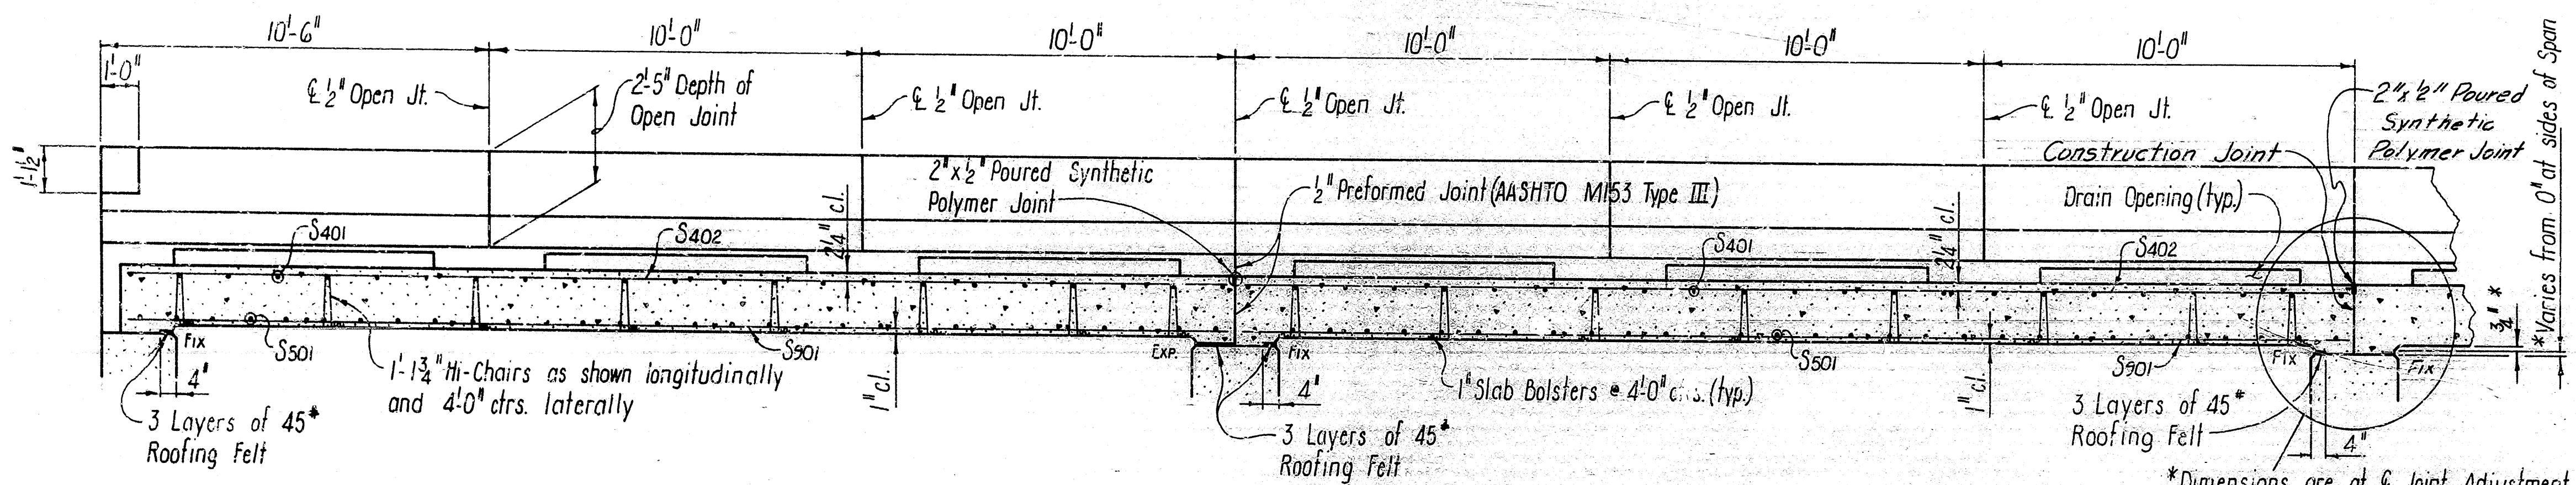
DETAILS FOR WIDENING 30'-0" R.C.D.G. SPANS
